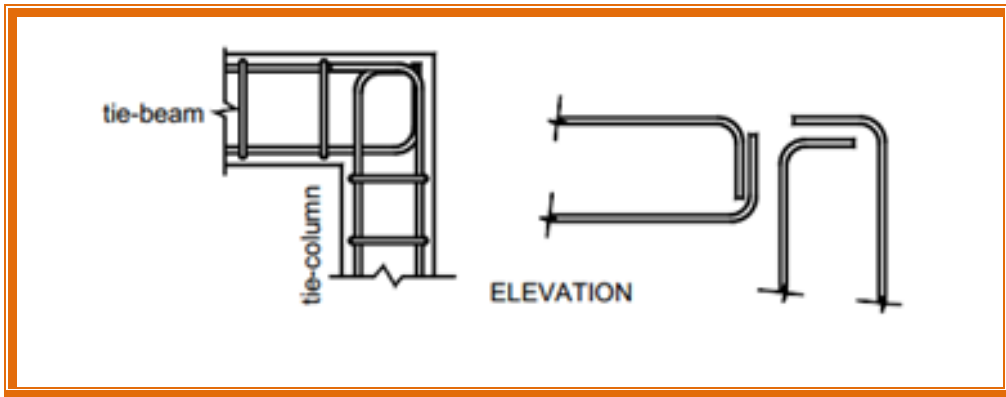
Anchorage of tie-beam and tie-column longitudinal reinforcement (EERI, IAEE, (2011), cited in Alcocer et al., (2003)).
